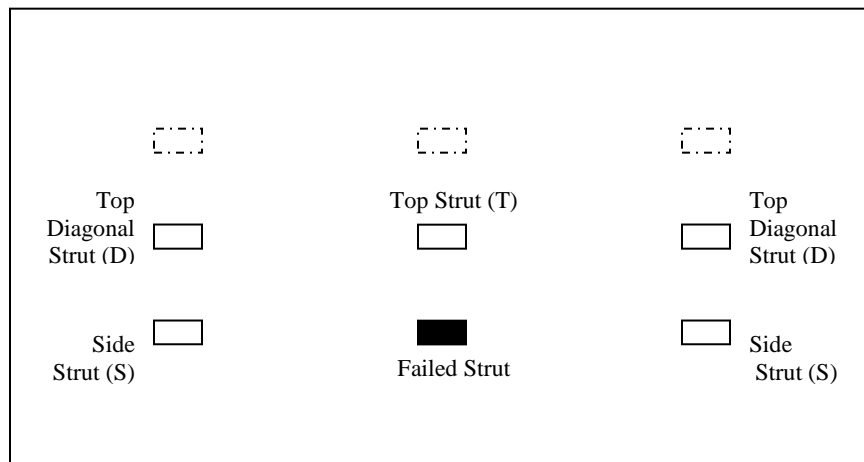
Elevation View of Struts Arrangement in Primary Wall
